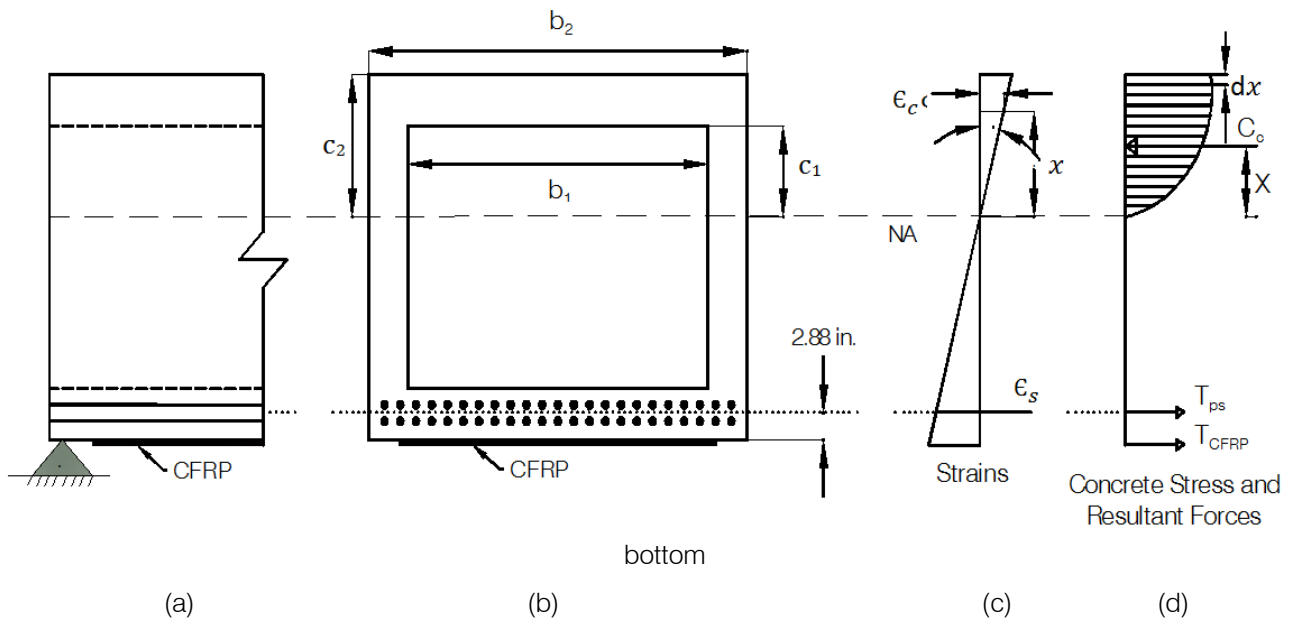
Strain and stress distribution for a simply-supported concrete box beam with CFRP retrofitting at the
